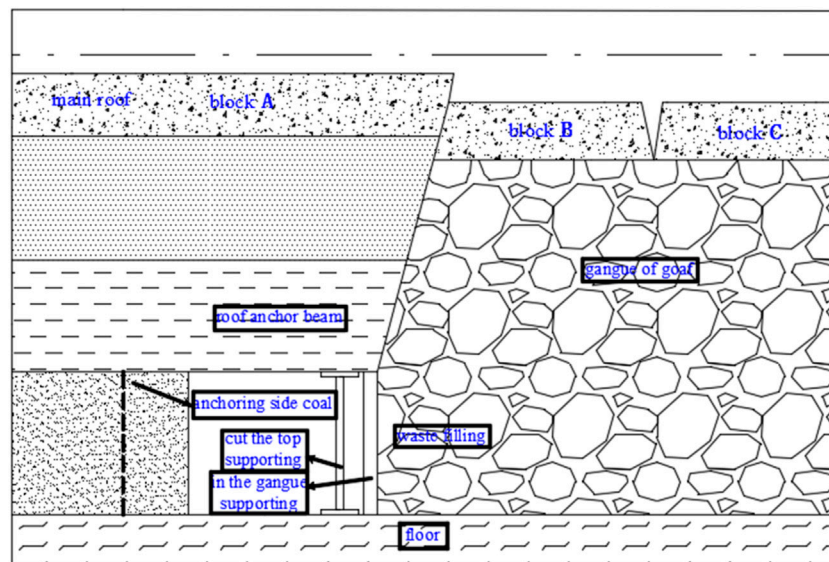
| Control diagram of “anchor - cut - support - block - close” of unfilled gob-side entry retaining structure.
